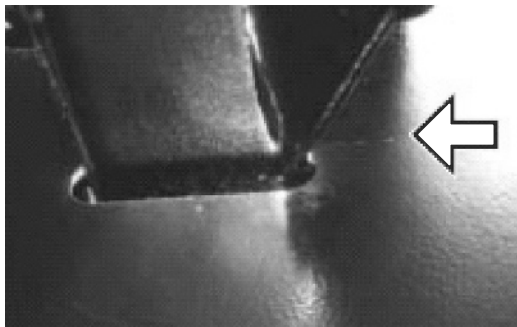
Photo of a fatigue crack propagating from a weld line with a lateral beam through U-shaped rib stiffener.
